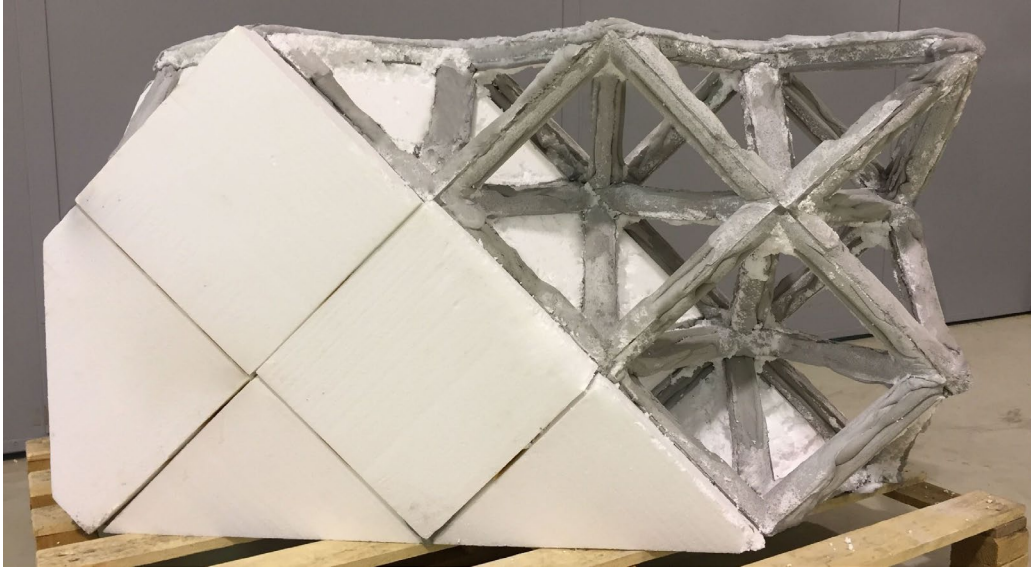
Space-Truss Masonry Wall prototype [7]
